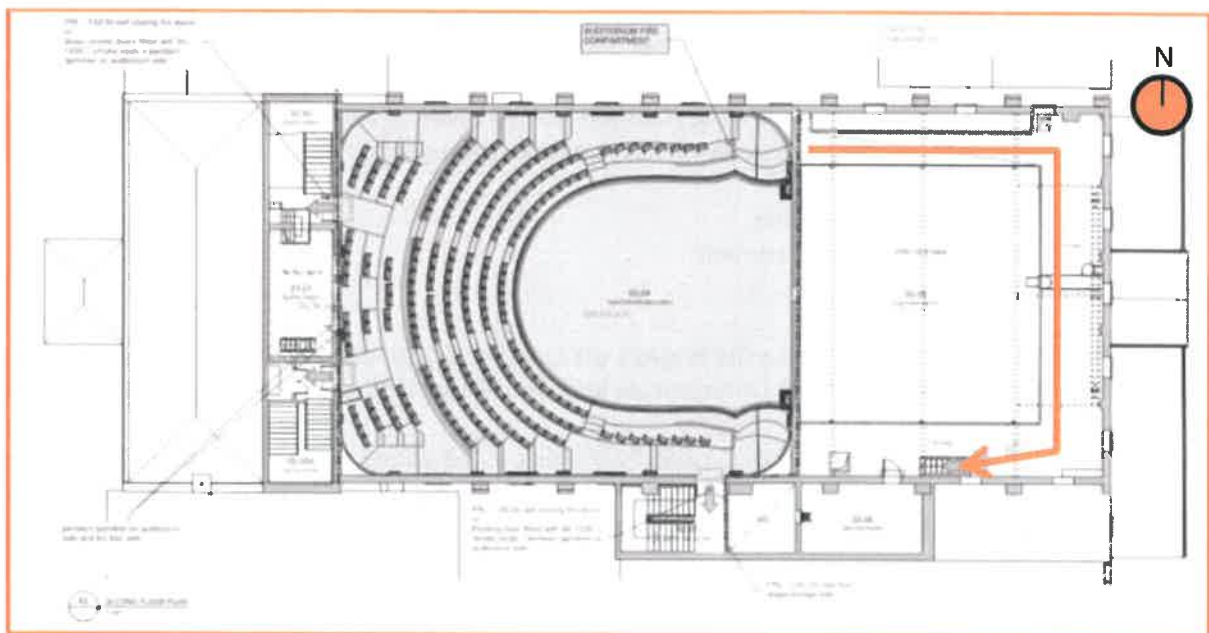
Egress via Second Floor Platform of 30m to single exit and non sprinkle protected auditorium
